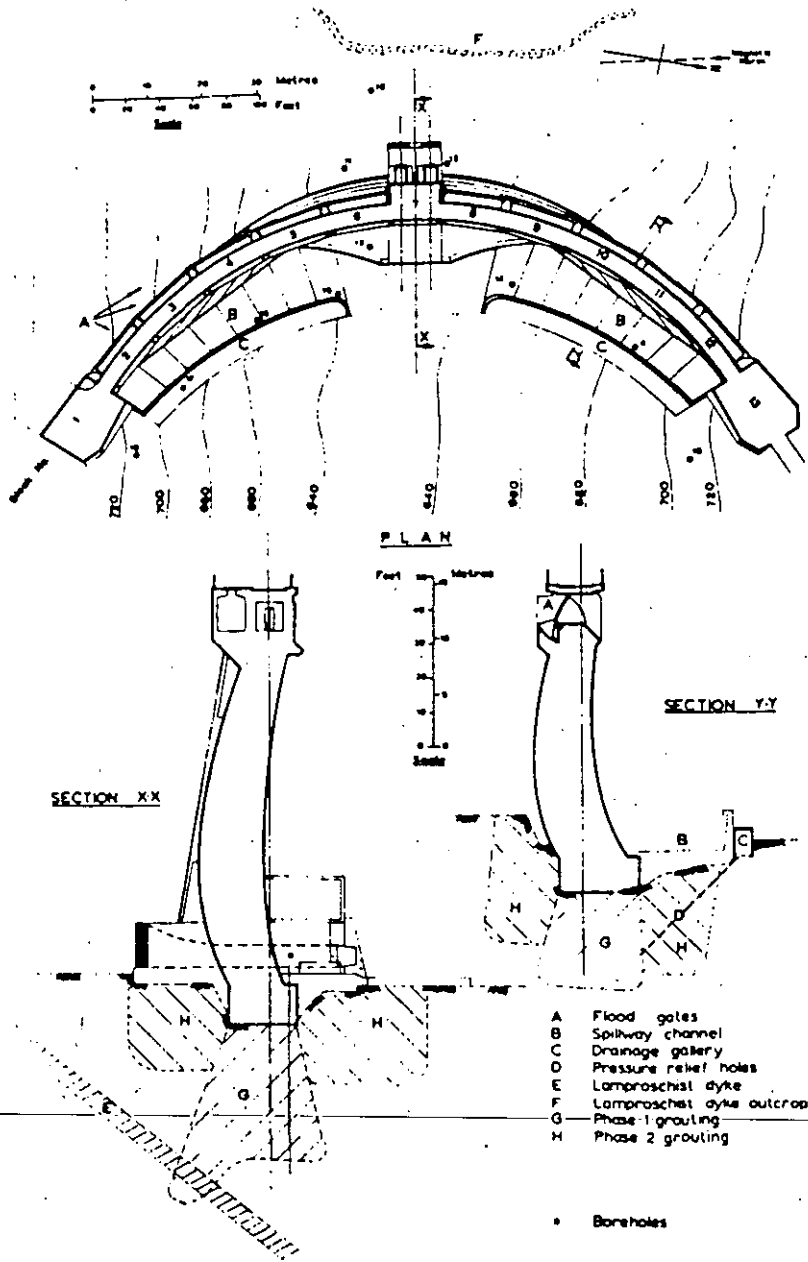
Monar Dam -- plan and section (after Henkel *et al* 1964)
